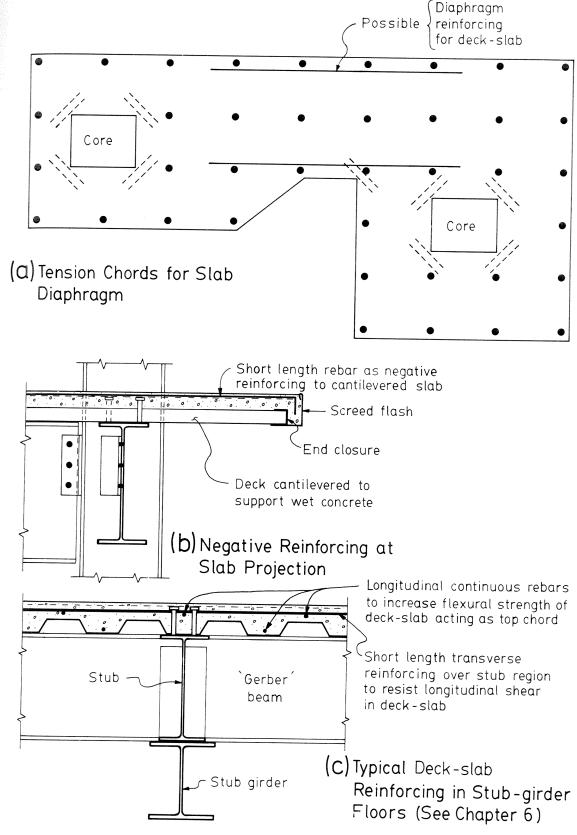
Examples of Structural Reinforcing in Deck-Slabs
